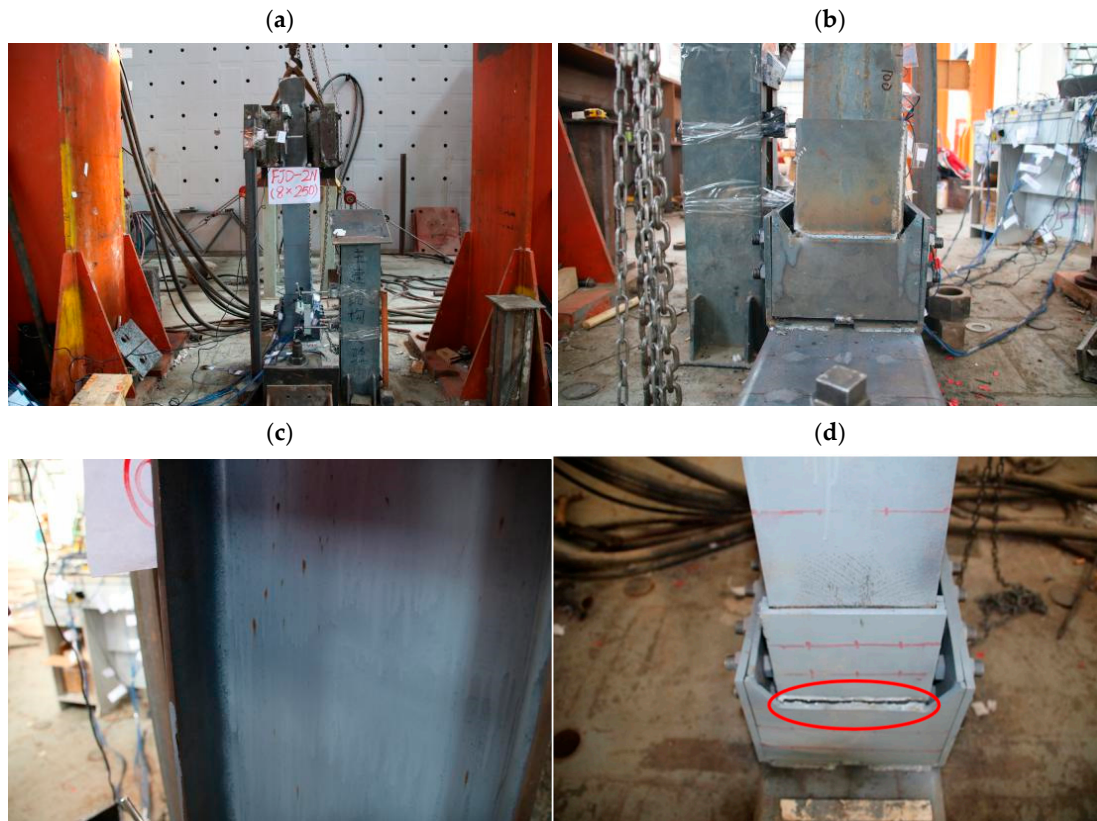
Test process and damage of FJD-1N specimen. (a) Test of the FJD-1N. (b) Rotation of the flange joint. (c) Bulging of the beam flange. (d) Loose paint on the web of the beam.
